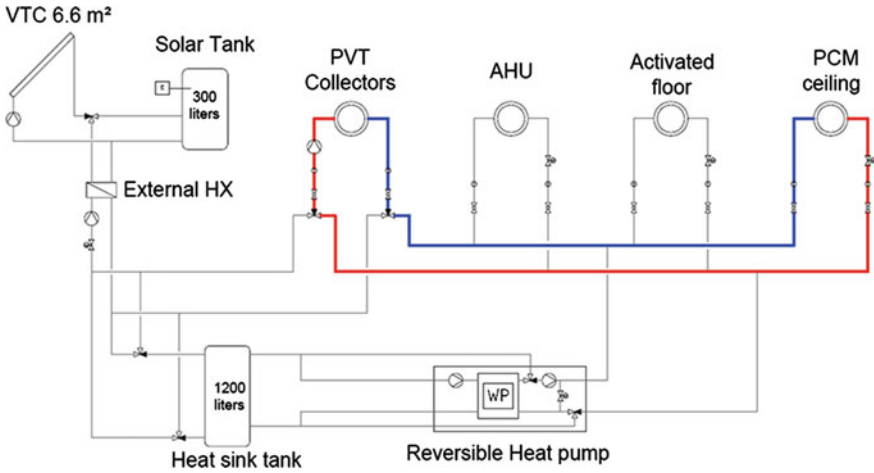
Hydraulic scheme of summer night PV/T collectors and PCM ceiling [1st Period] (Source HFT Stuttgart)
